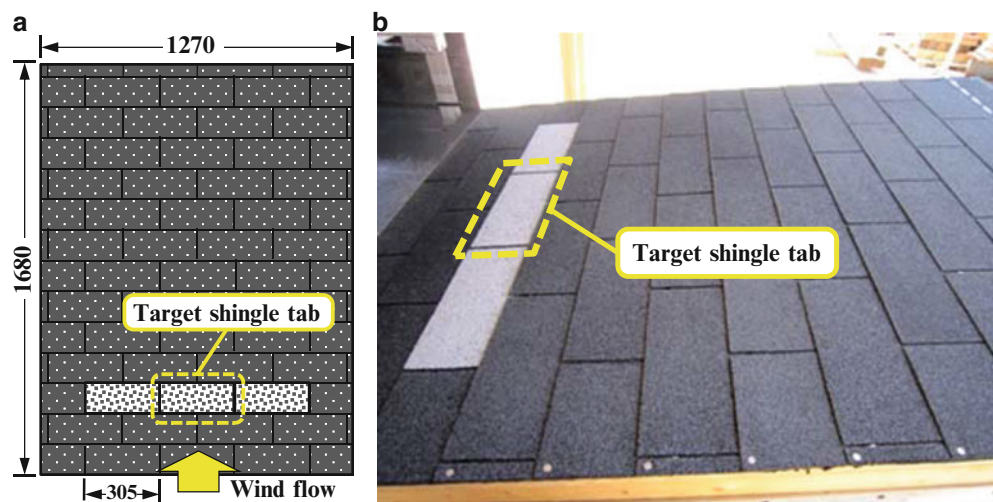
Roof panel specimen with target shingle: (a) schematic of plan view; and (b) photograph. Dimensions in mm
